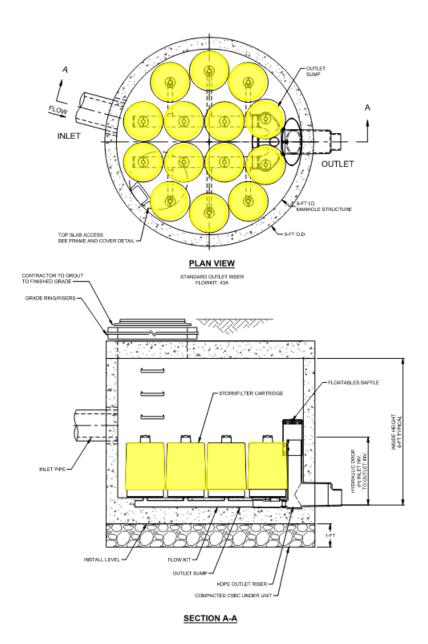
StormFilter Facility Details: 8-foot Diameter Manhole (WQ-3 and WQ-4)
